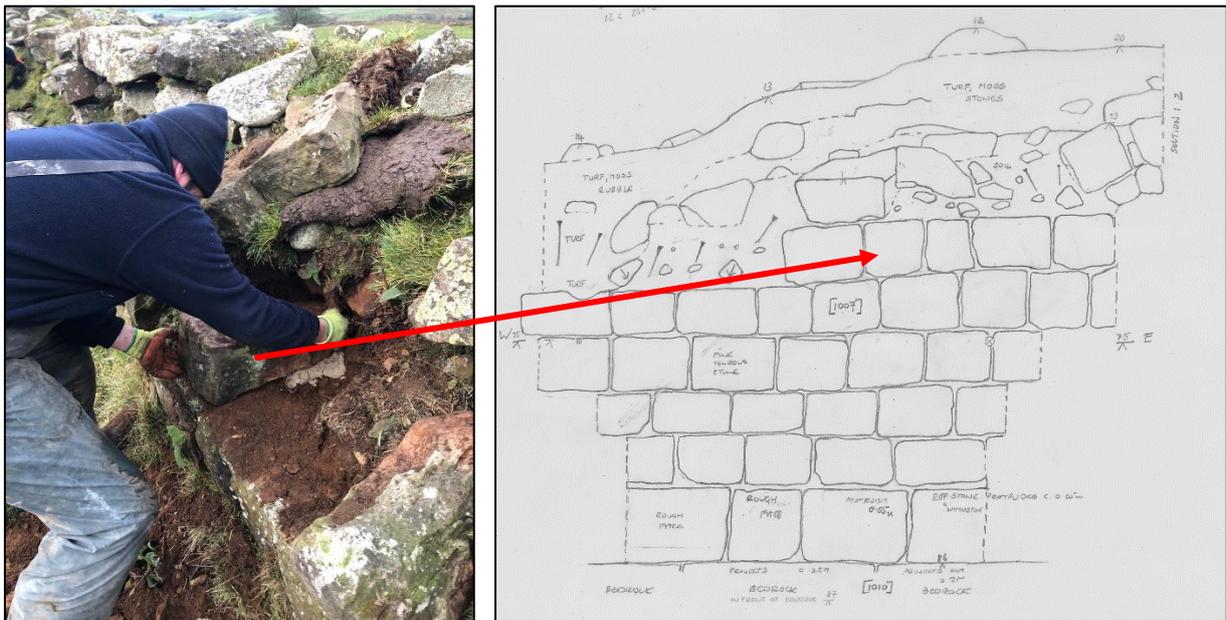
left, rebedding at work in the Trench 1 area after backfilling; right, field drawing facing south showing re-set partial course and tail-bedded single stone of course above
